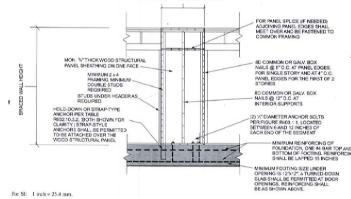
ALTERNATE BRACED WALL PANEL
